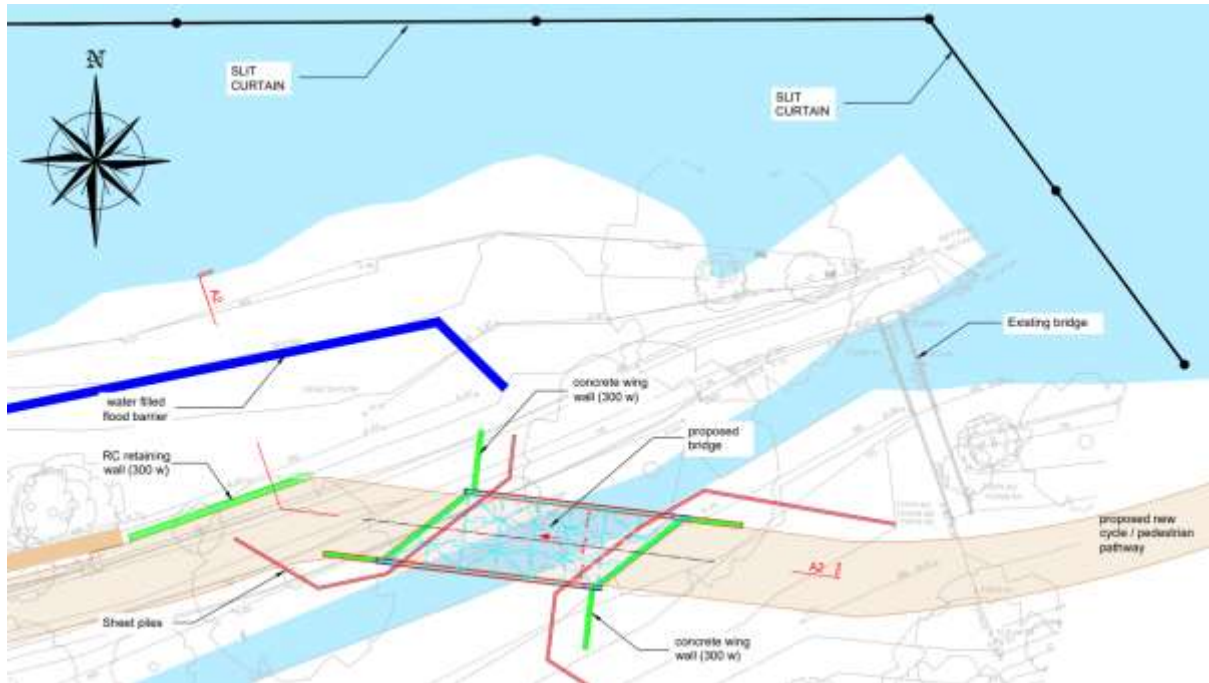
Plan of proposed Bridge 5 and proposed Ramp, showing proposed Silt Curtain, Sheet piles and water filled flood barrier (refer to drawing RHA-XX-DR-S-SP0052)
